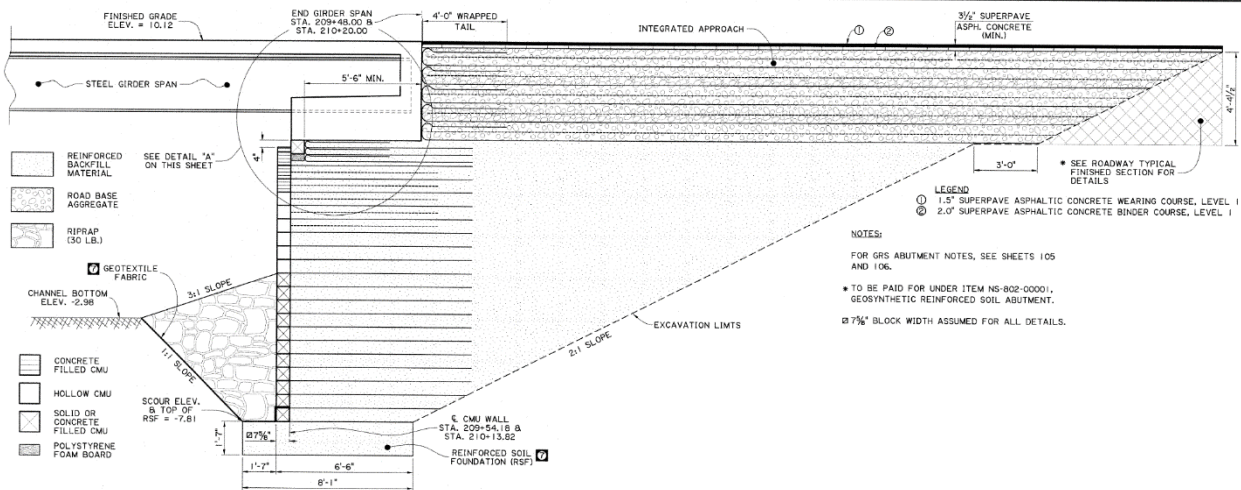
Diagram. GRS abutment section view of Maree Michel Bridge.
